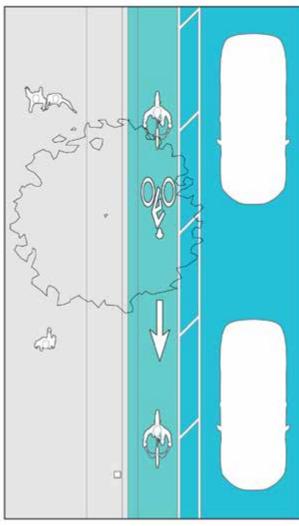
Typical Class II Bikeway, Buffered, Adjacent to Travel Lane.
